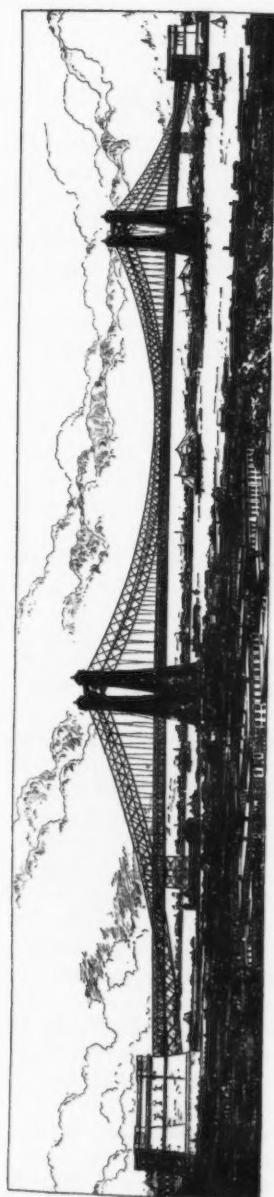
SUSPENSION BRIDGE NEAR 23D STREET, MANHATTAN, DESIGNED BY G. LINDENTHAL, IN 1899.
